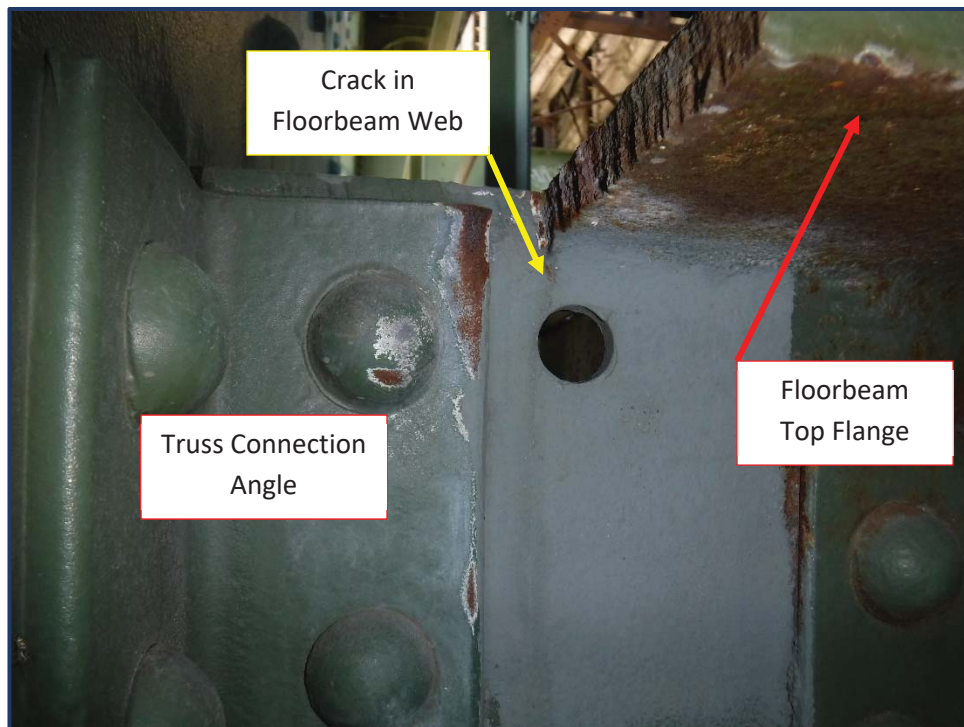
Cracks in Maintenance Deck Floorbeam Web at Truss Connection
